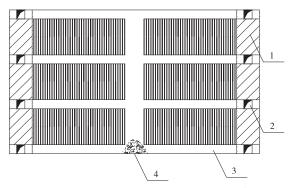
Pre-splitting blast-hole layout plan of ore-rock boundary
